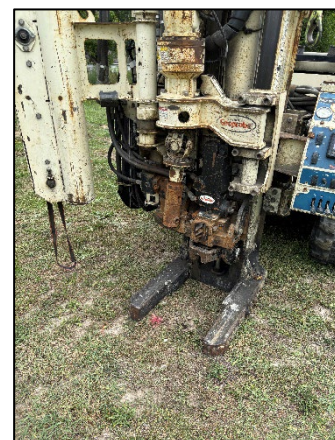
Viewing 14119 SB03 Drilling, Facing West.
